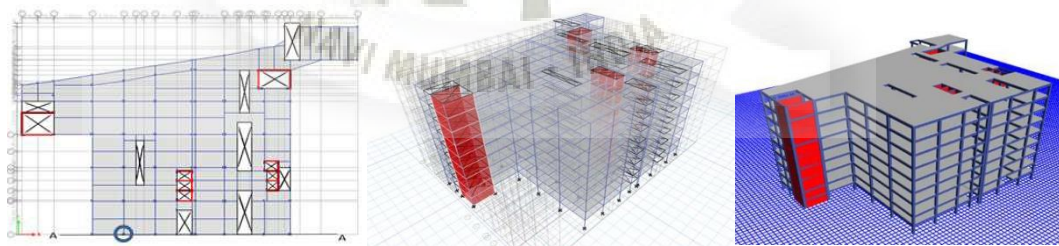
Plan from ETABS, 3D view of the building and rendered view⁽⁹⁾
